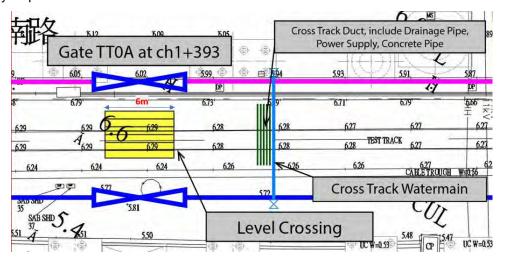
Cross Track Duct next to Gate TT0A
